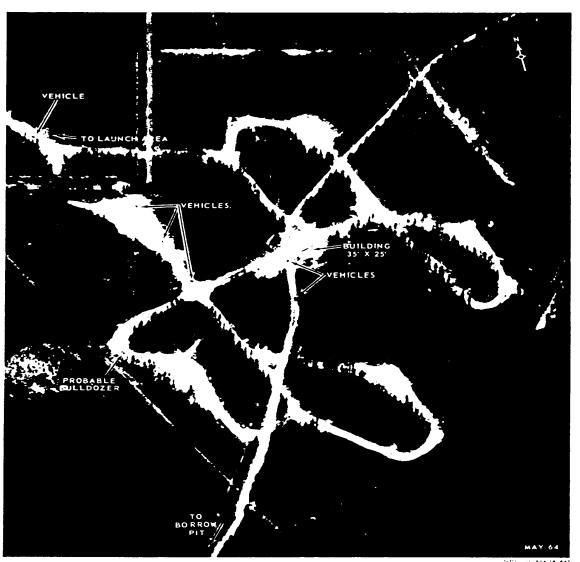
NEW UNIDENTIFIED FACILITY, UNDER CONSTRUCTION.
